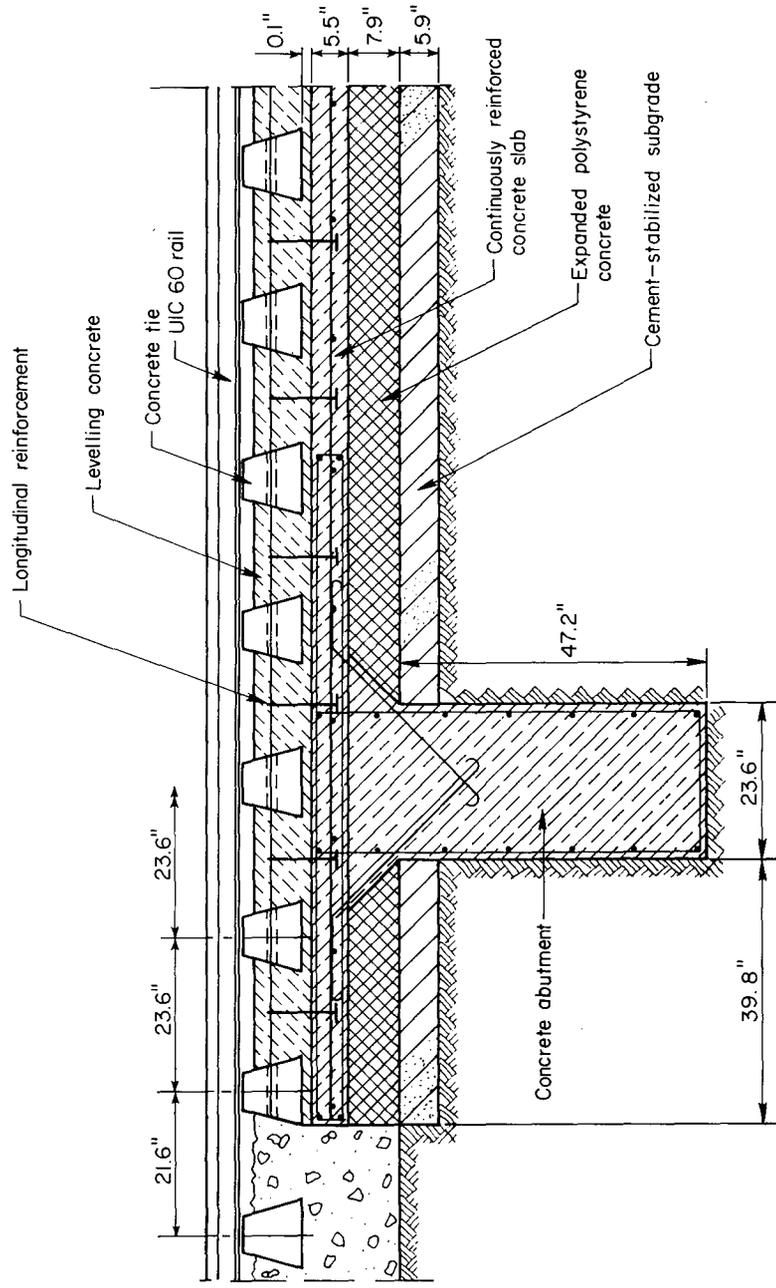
25. LONGITUDINAL SECTION OF SLAB TRACK AT RHEDA
